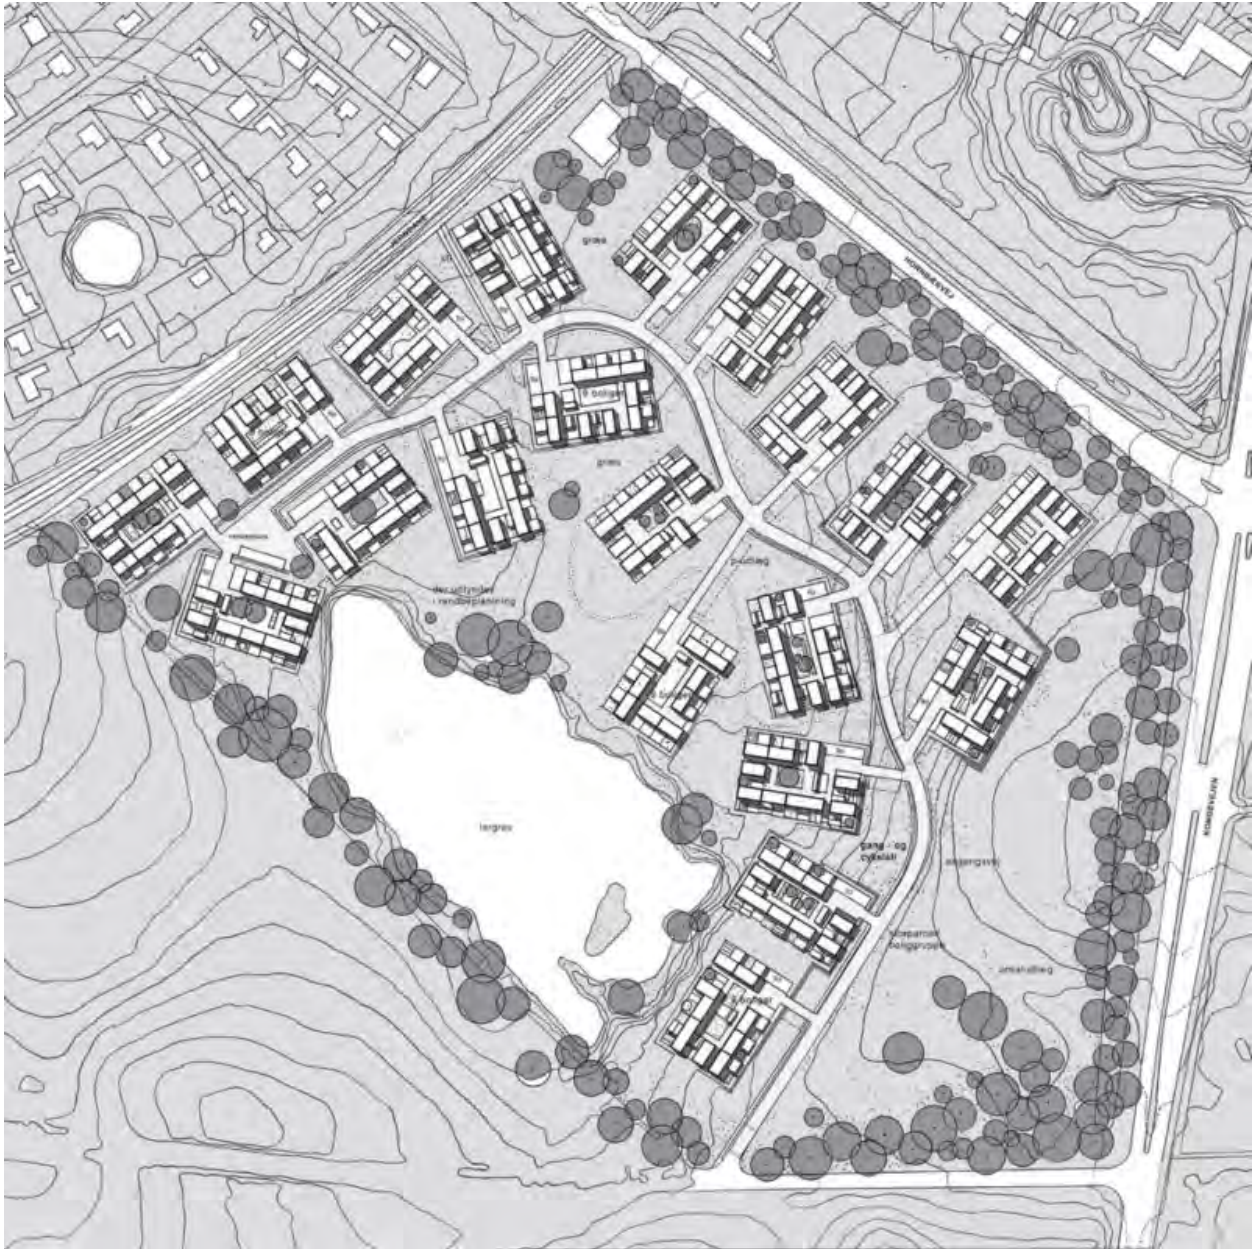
Vandkunsten – Better Cheaper Housing Site Plan
